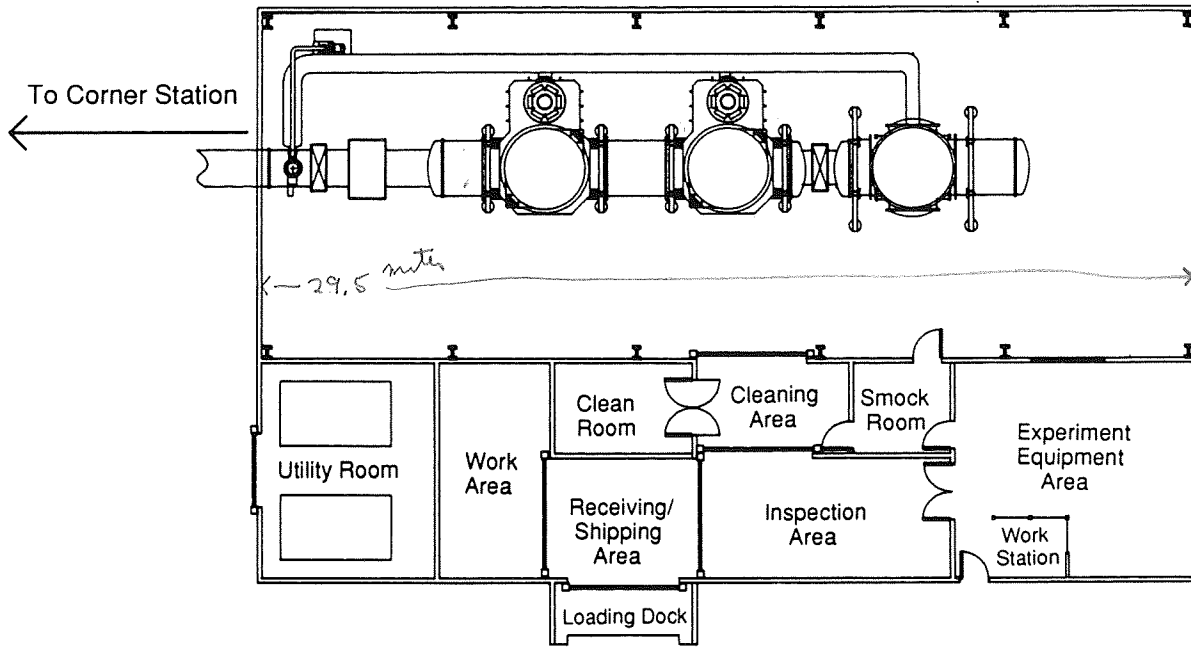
Floor plan of the right-arm end stations for Phase C (common to both sites). The left-arm end stations have similar (mirror-imaged) floor plans.
